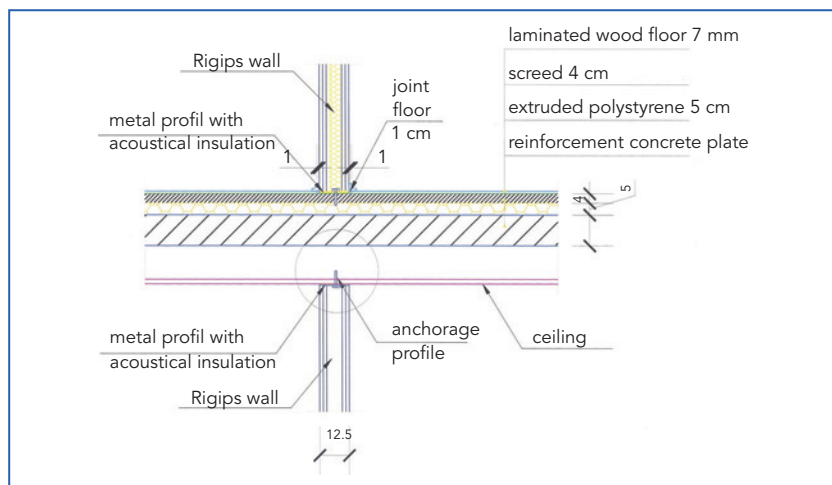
Example of the typical errors for inner walls - upper contact wall with light ceiling.
